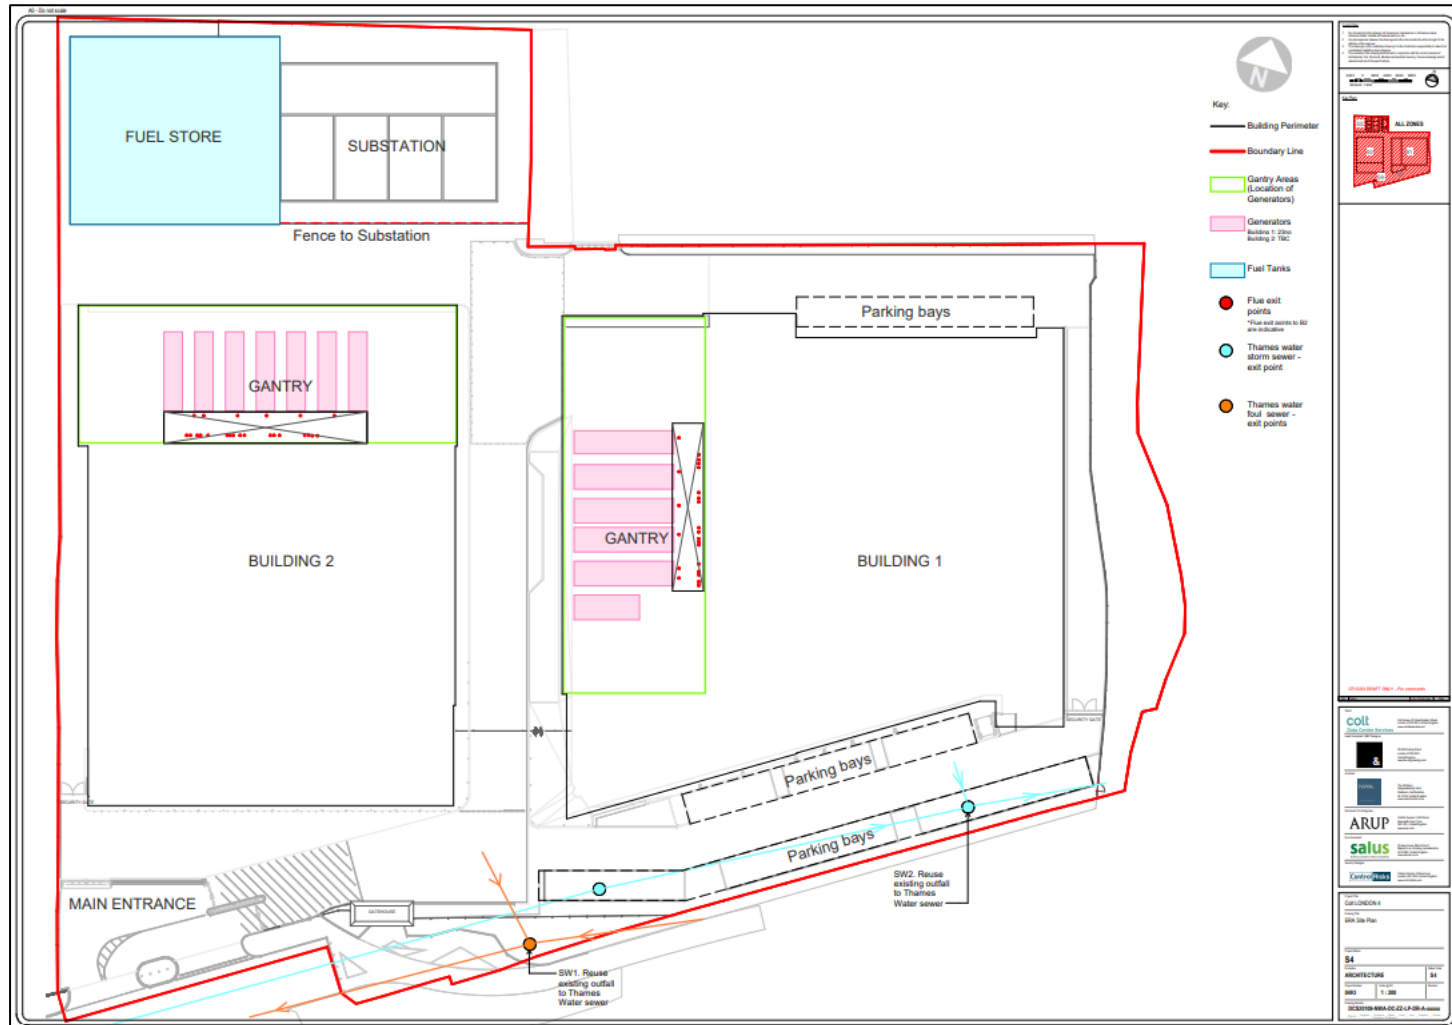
PLAN SHOWING LOCATION OF BUILDING 1 AND BUILDING 2 GANTRY LOCATIONS, WHERE GENERATORS ARE LOCATED
